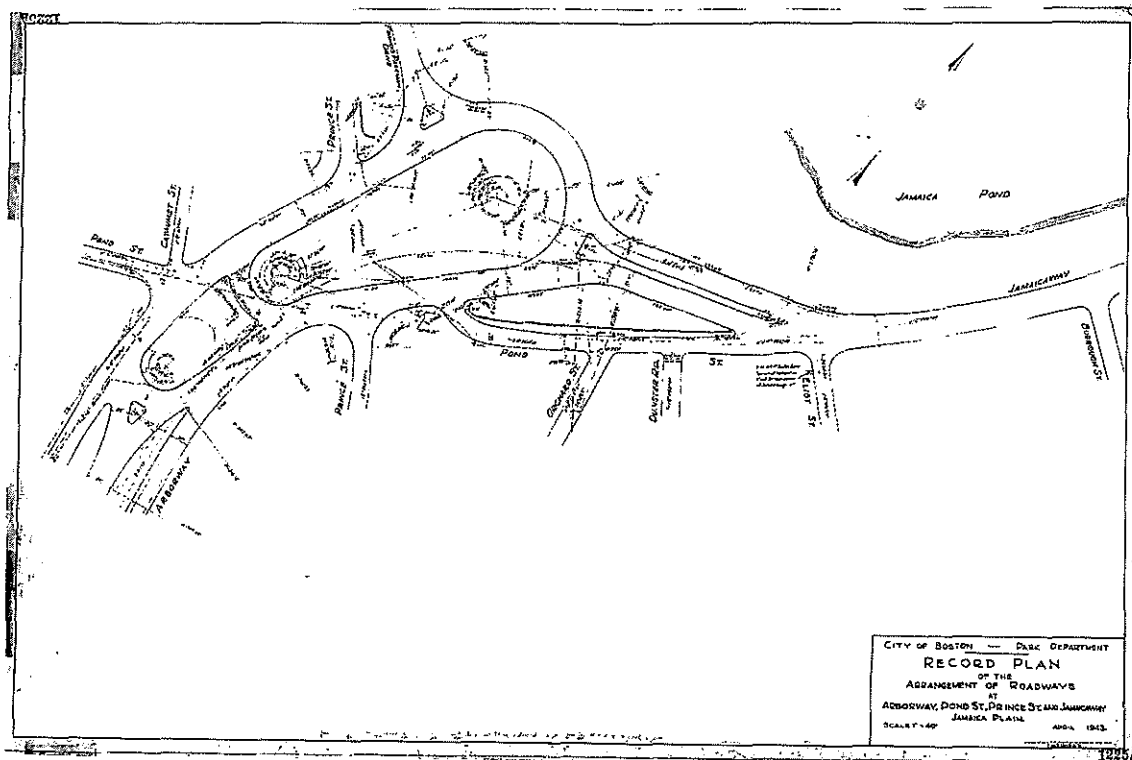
Plan for Kelley Circle Titled City of Boston Park Department Record Plan of the Arrangement of Roadways at Arborway, Pond Street, Prince Street and Jamaica Way Jamaica Plain," April 1943 (BRRD # 1225A).
